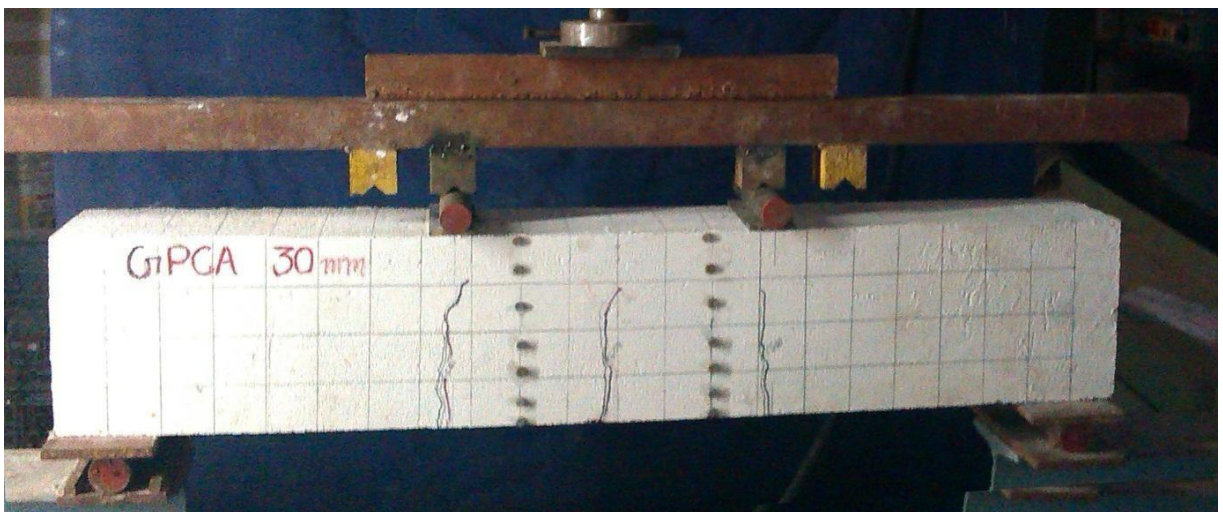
Crack pattern of GPCA 30mm specimen
